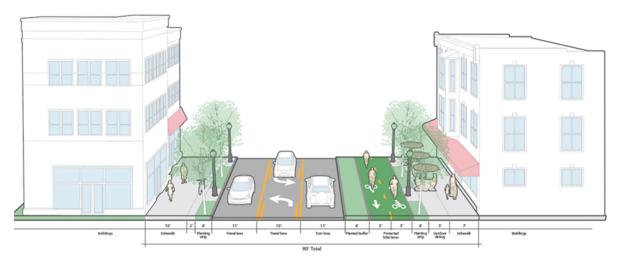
Livingston Road with Center Turn Lane and Elevated Bike Lanes
